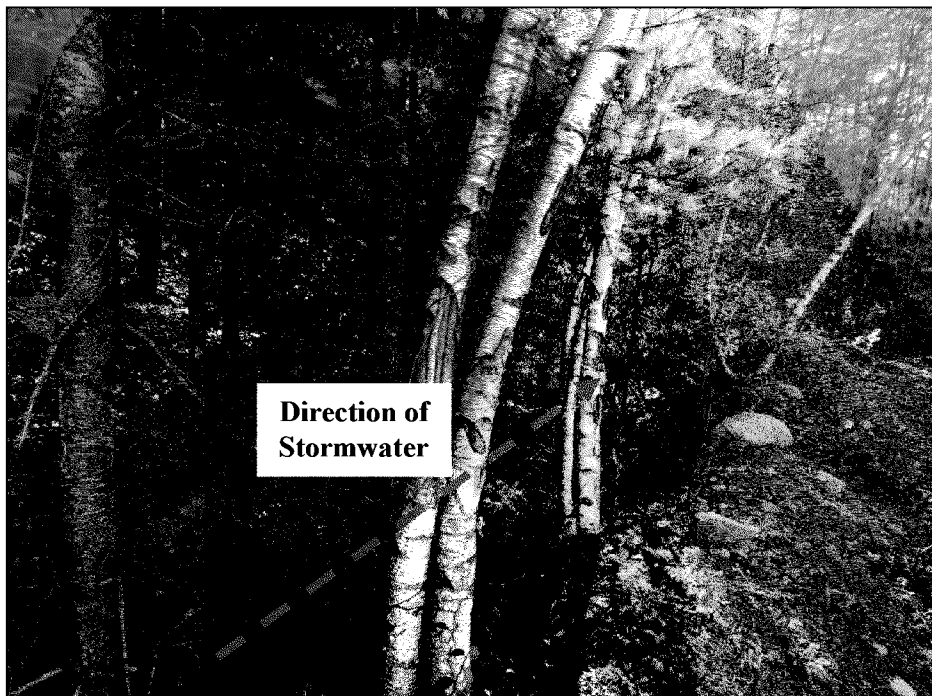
View, facing southwest, of the south ditch that drains to the detention basin in the southeast corner.
